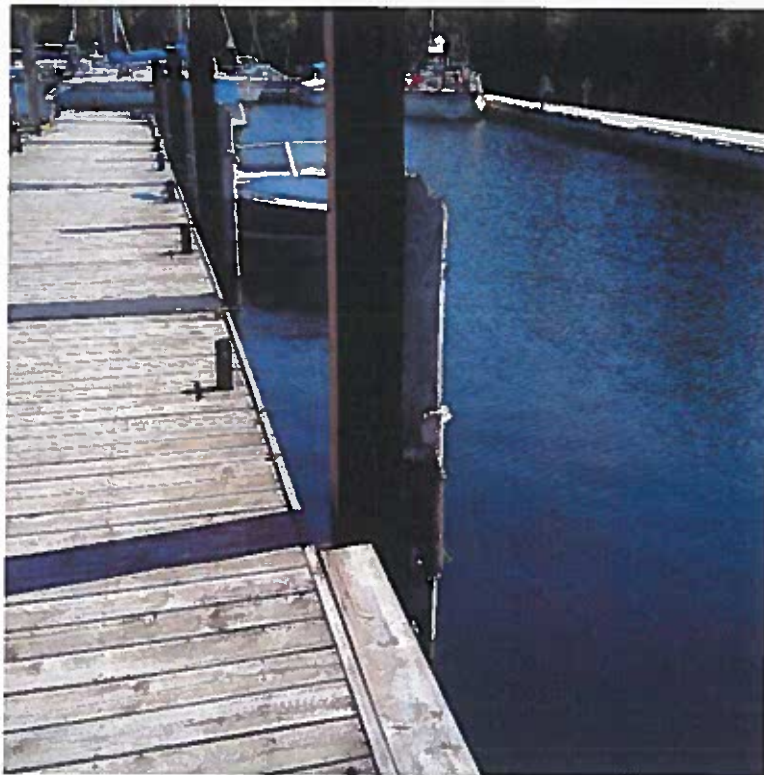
The Alley (centre), Steel Piles Supporting the Alley Dock (left), and Wooden Jetty (right), Looking East from Alley Dock
